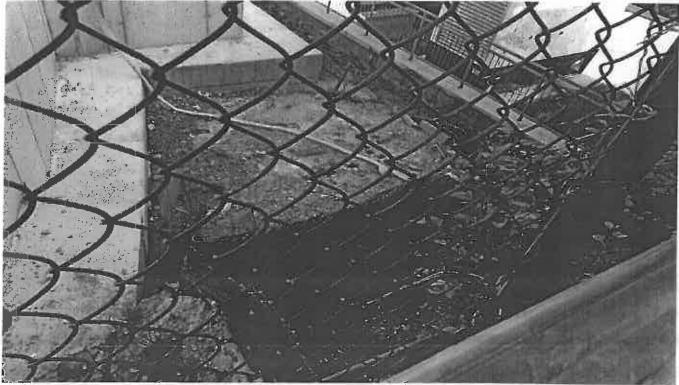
Exposed soil and unmaintained E and S controls at the Slope of the Tunnel Project North of the Site
